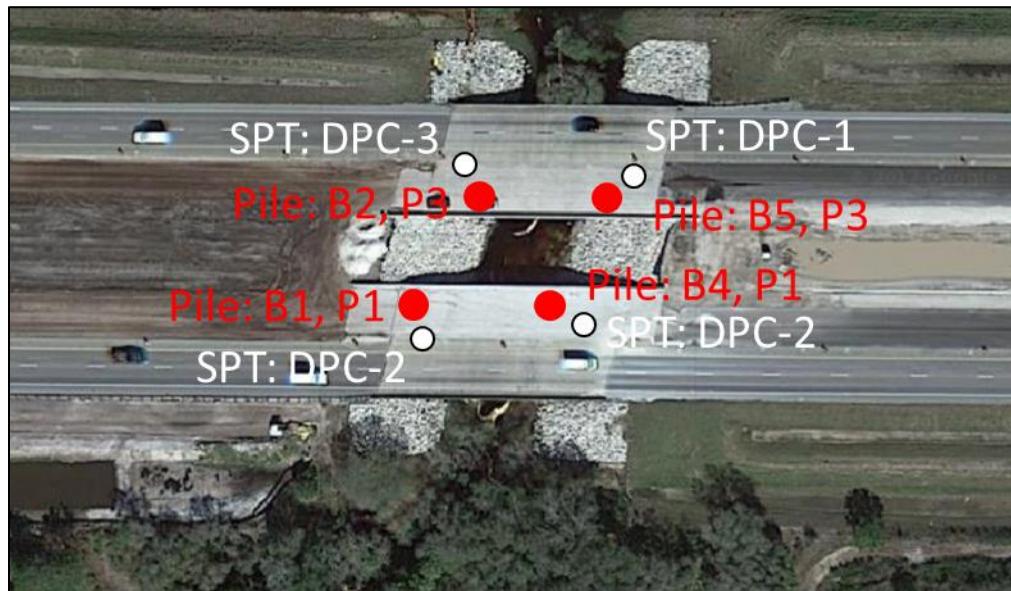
Test pile and SPT boring locations for I-75 over Deer Prairie Creek
